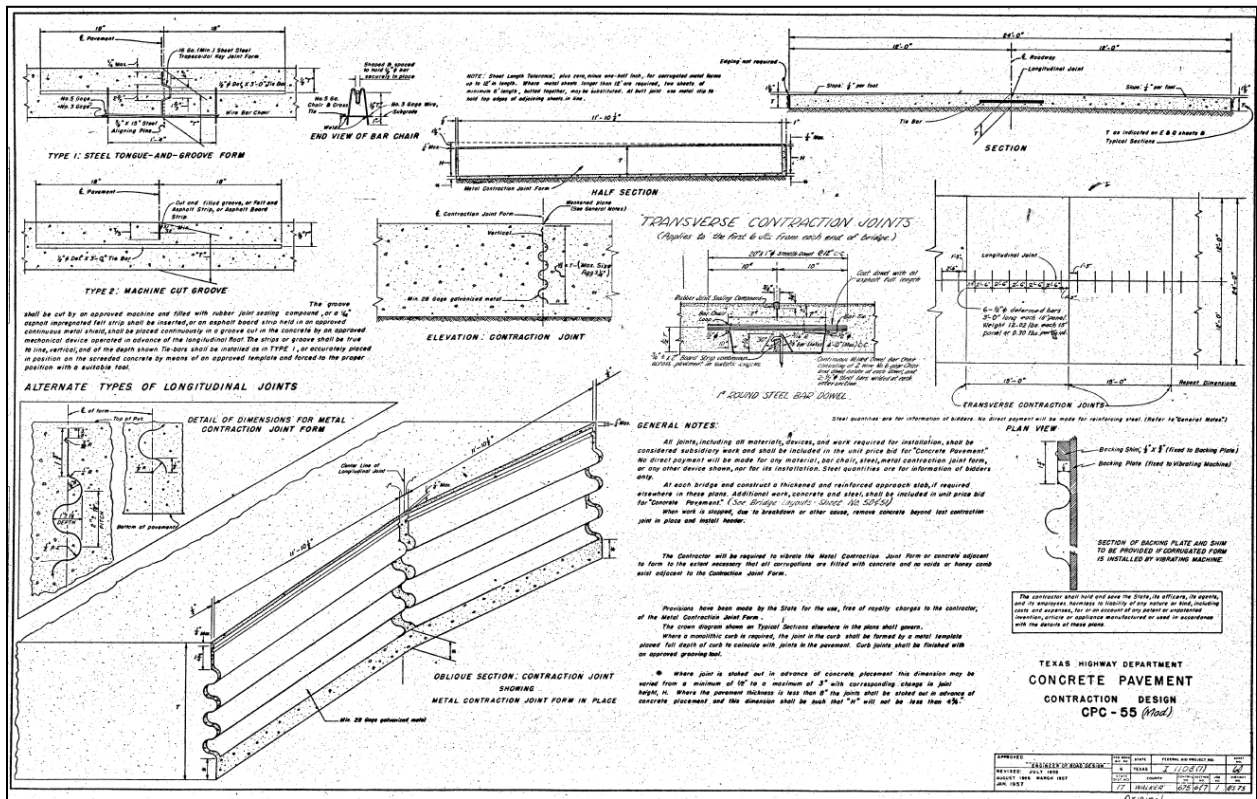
Concrete Pavement Standard (1957) from SH 30 to North of SH 75.
